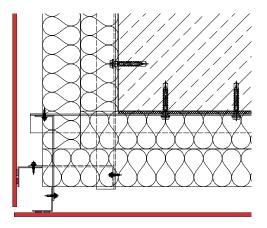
DETAILS OF BONDING ON A METAL BASE STRUCTURE
